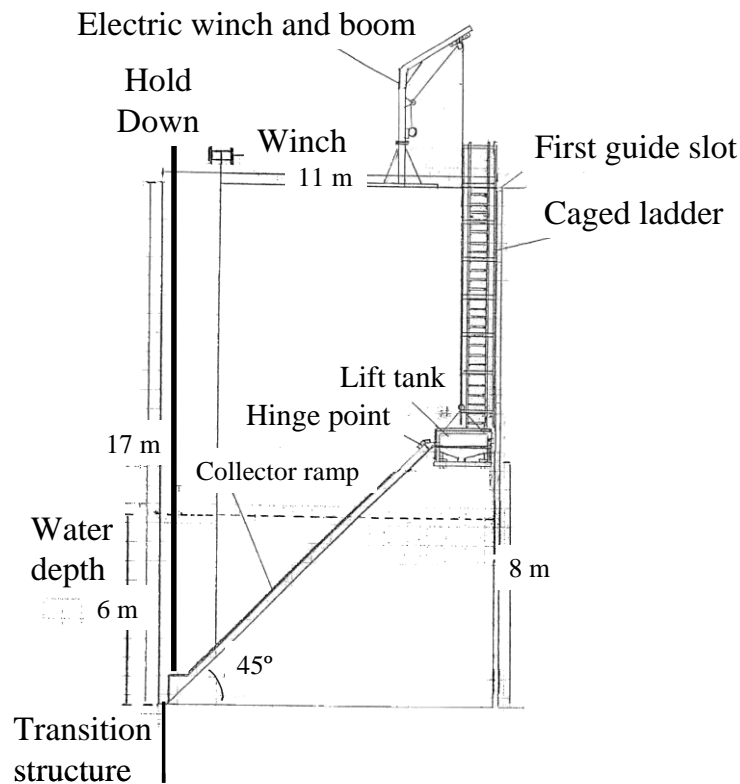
Side view (north wall) of the prototype entrance collector at the downstream Washington-shore fishway entrance.
